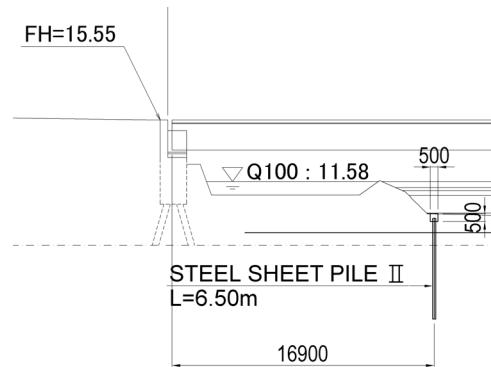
Profile of the Bank Protection Steel Sheet Pile Foundation
